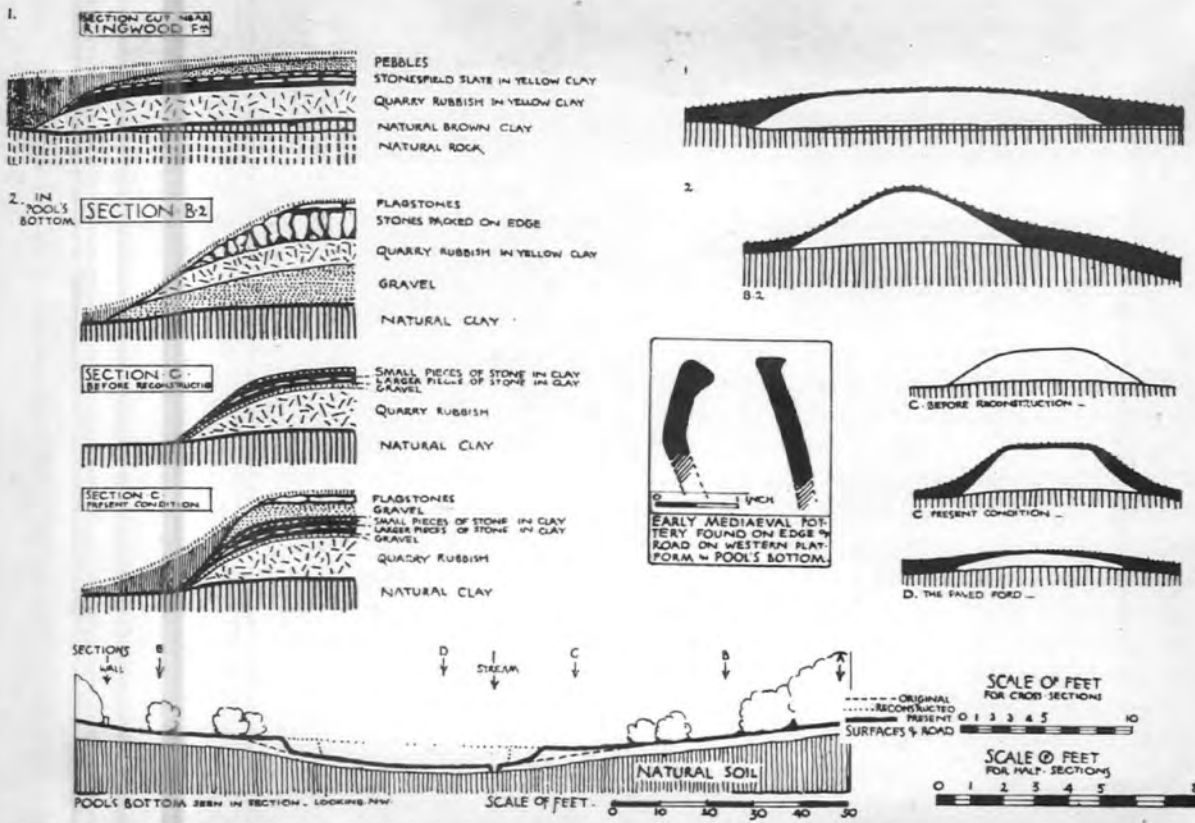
Sections, &c.: excavations in Pool's Bottom.
